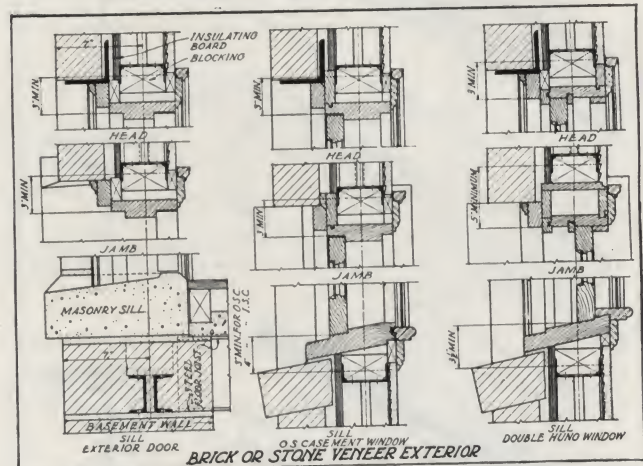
Typical Details for Wood Casements and Double Hung Windows, Showing Blocking
